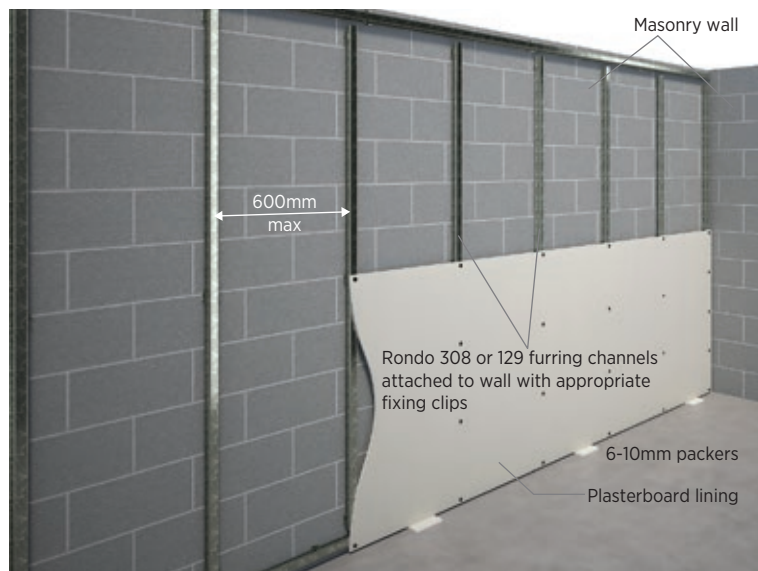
Fixing to Furring Channels Clipped to Wall
